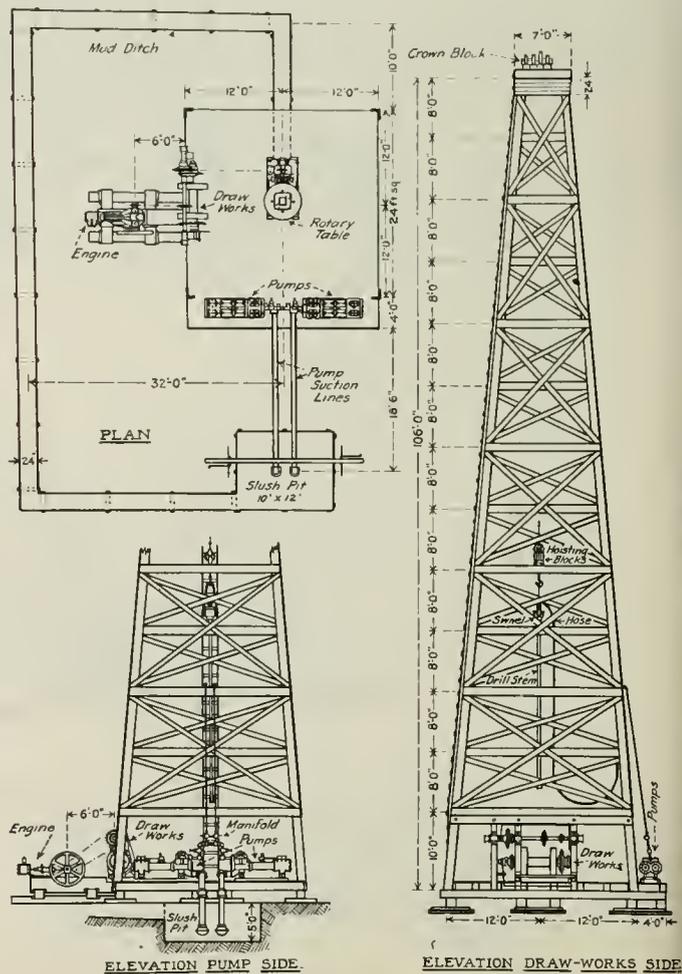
A California-type rotary drilling rig. (Courtesy of McGraw-Hill Book Co., Inc.)
